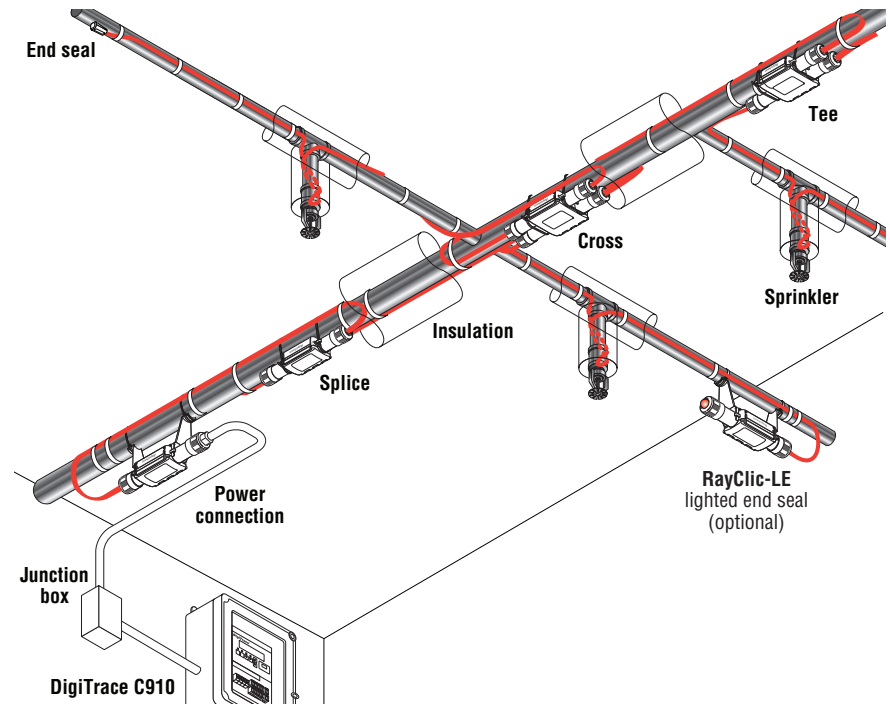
Typical fire suppression system for branch lines with sprinklers
